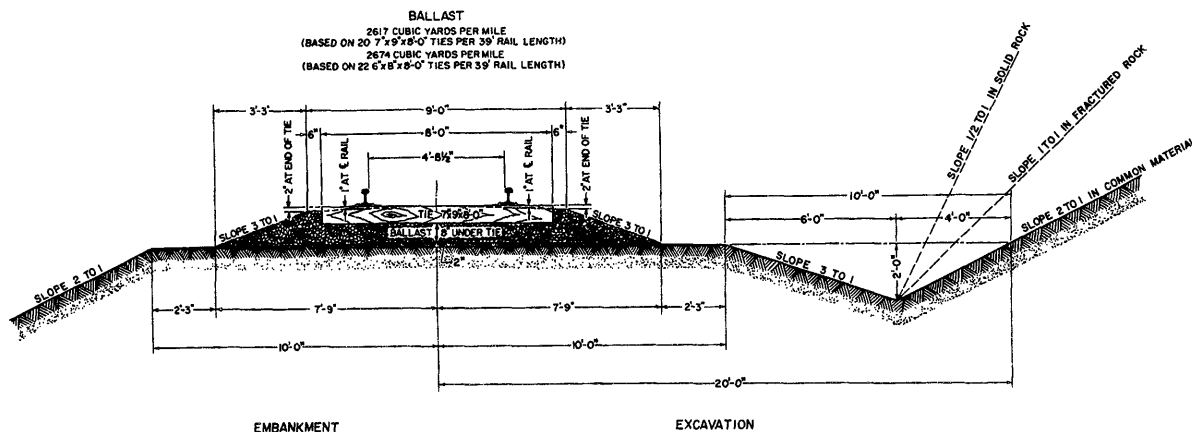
Typical standard gauge railroad profile, from Union Pacific standards
